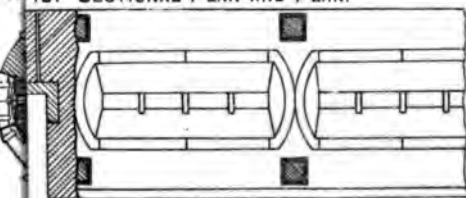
19.—SECTIONAL PLAN AND PLAN.
